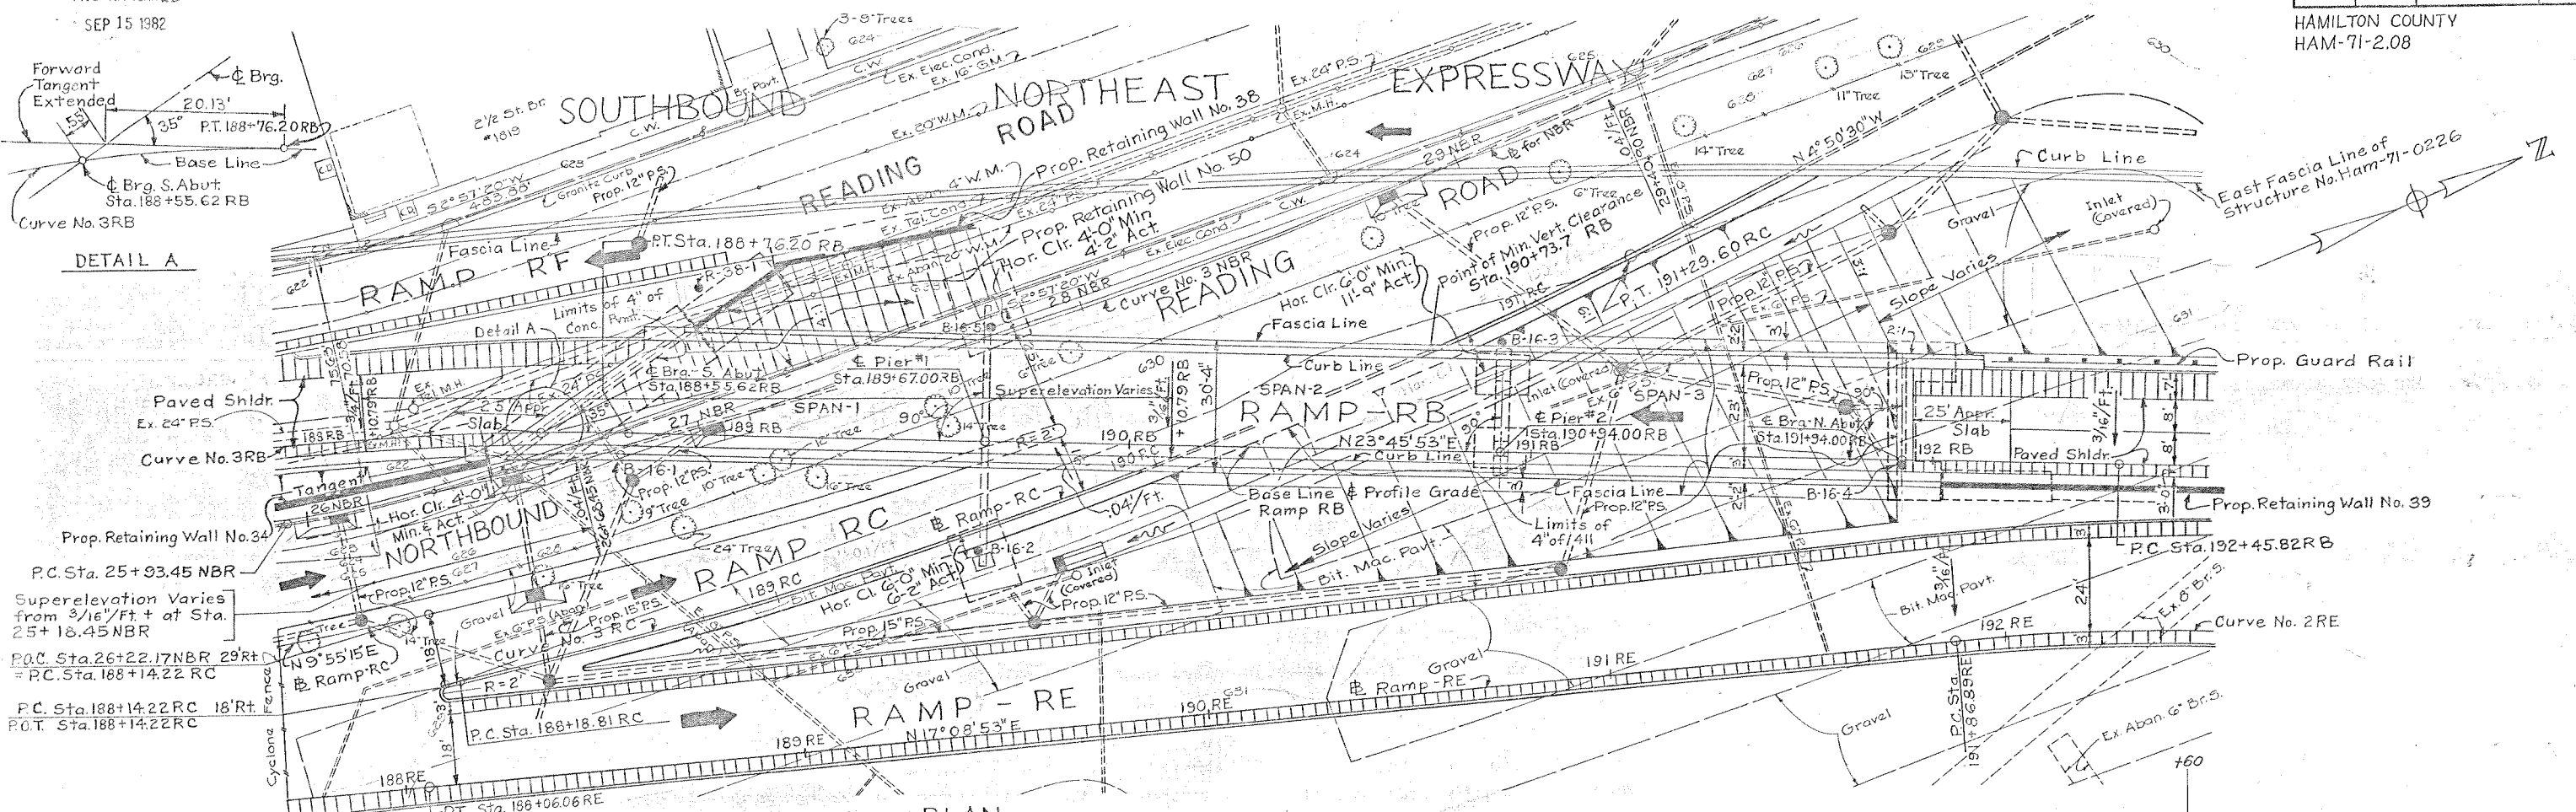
EXISTING PIER CAP PLANS
